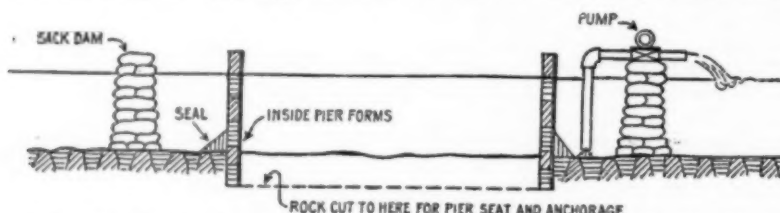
Sack Dam Used in Foundation Work on Rock at Shallow Depths and Where the Current Is Not Strong
